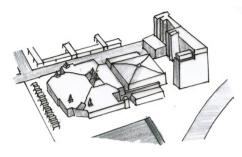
EXISTING SITE 3D diagram of existing project site
